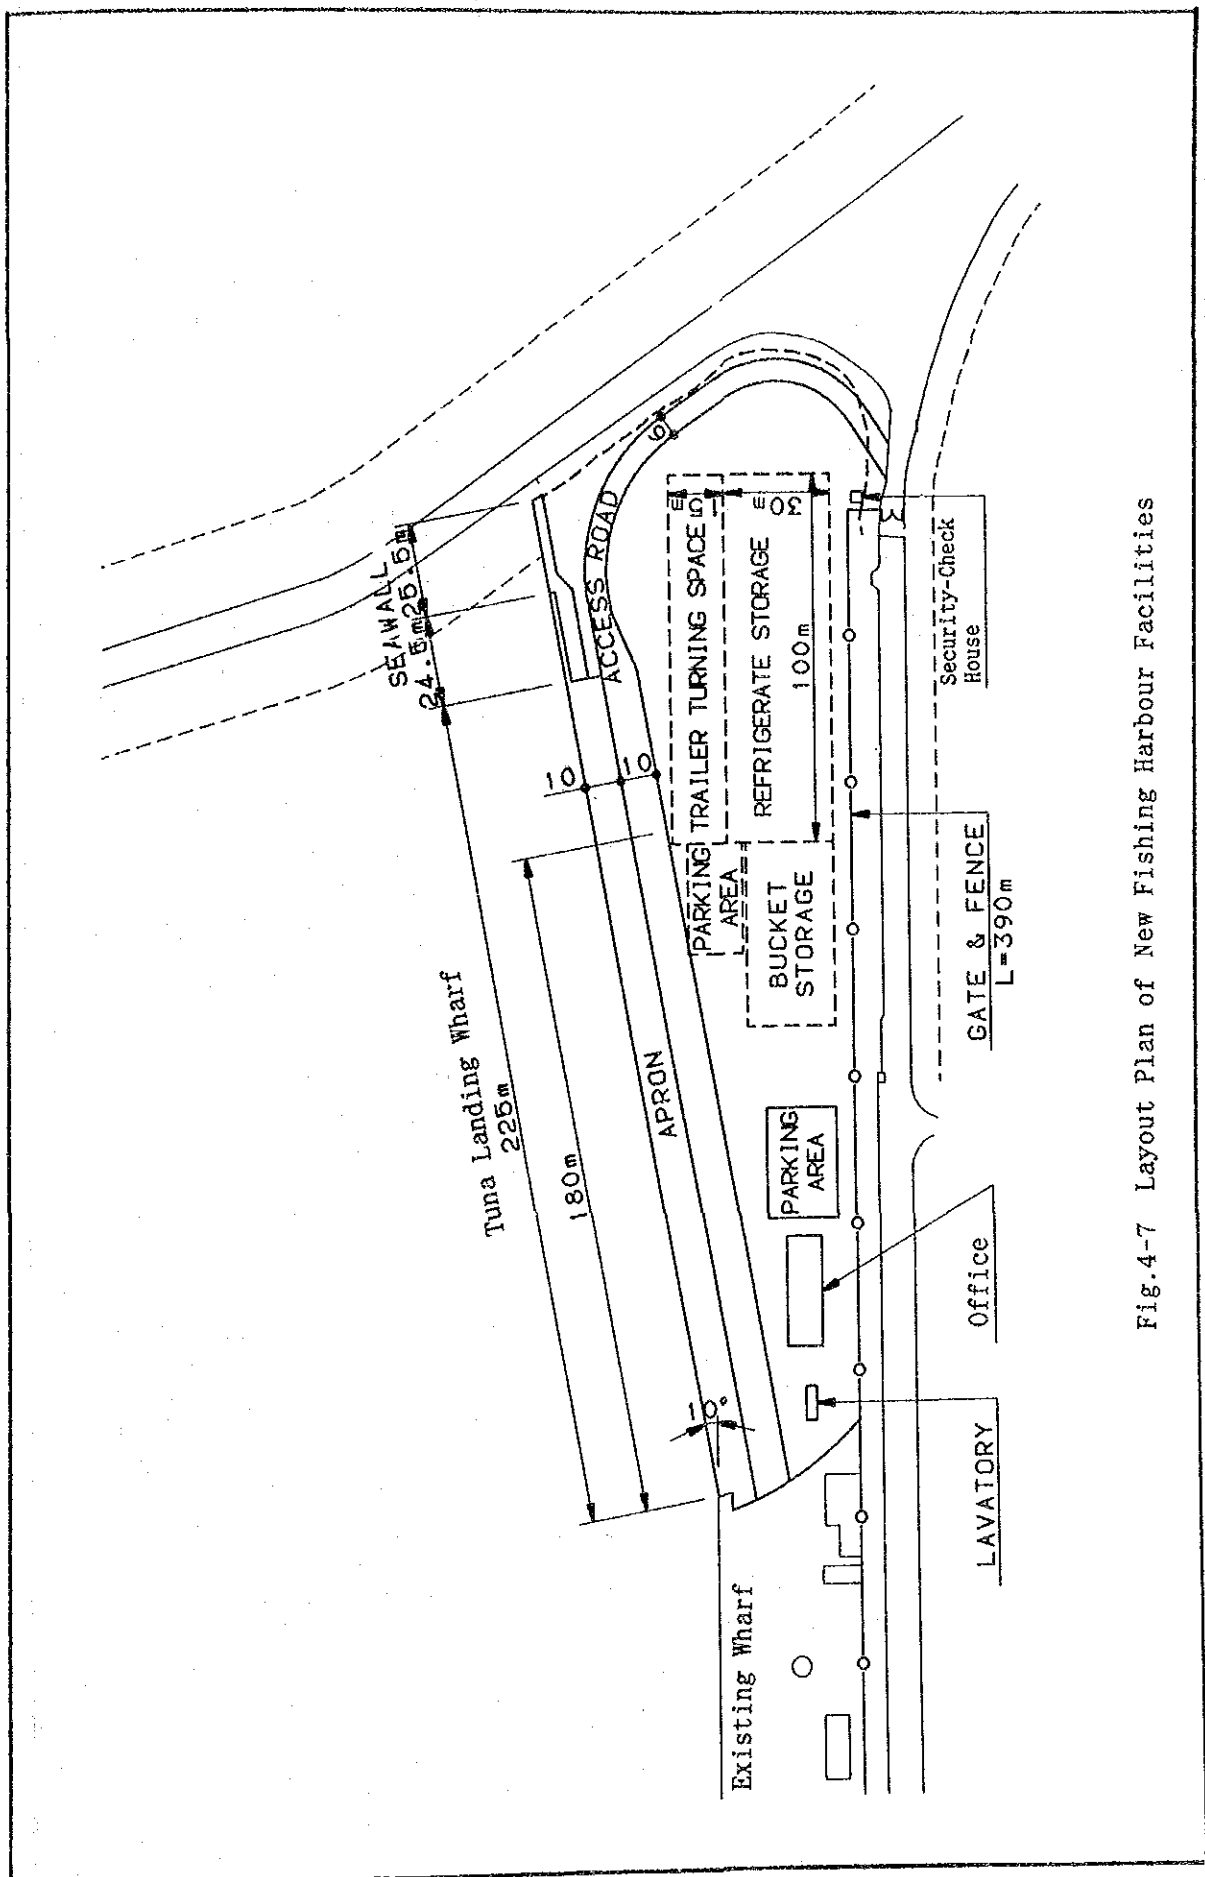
Layout Plan of New Fishing Harbour Facilities
